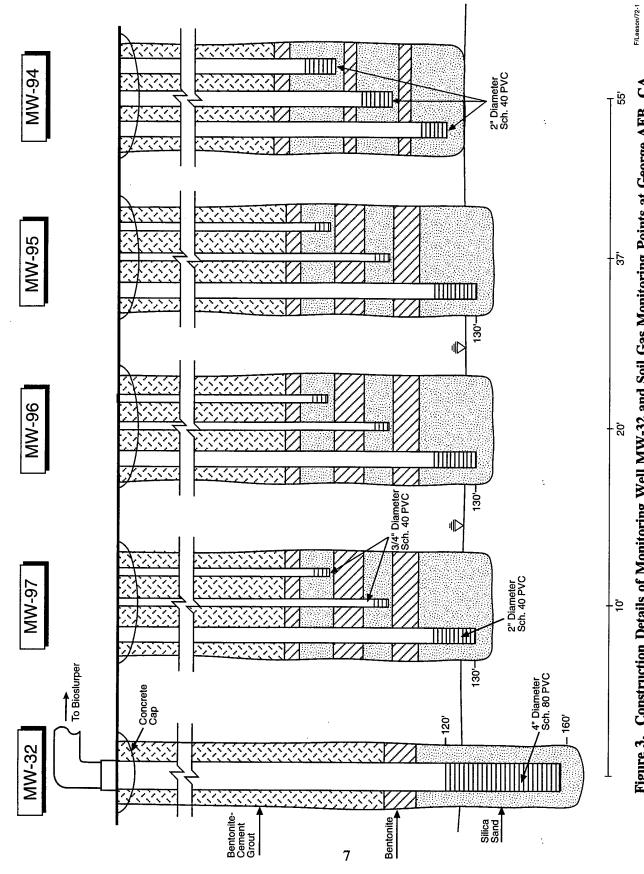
Construction Details of Monitoring Well MW-32 and Soil Gas Monitoring Points at George AFB, CA
